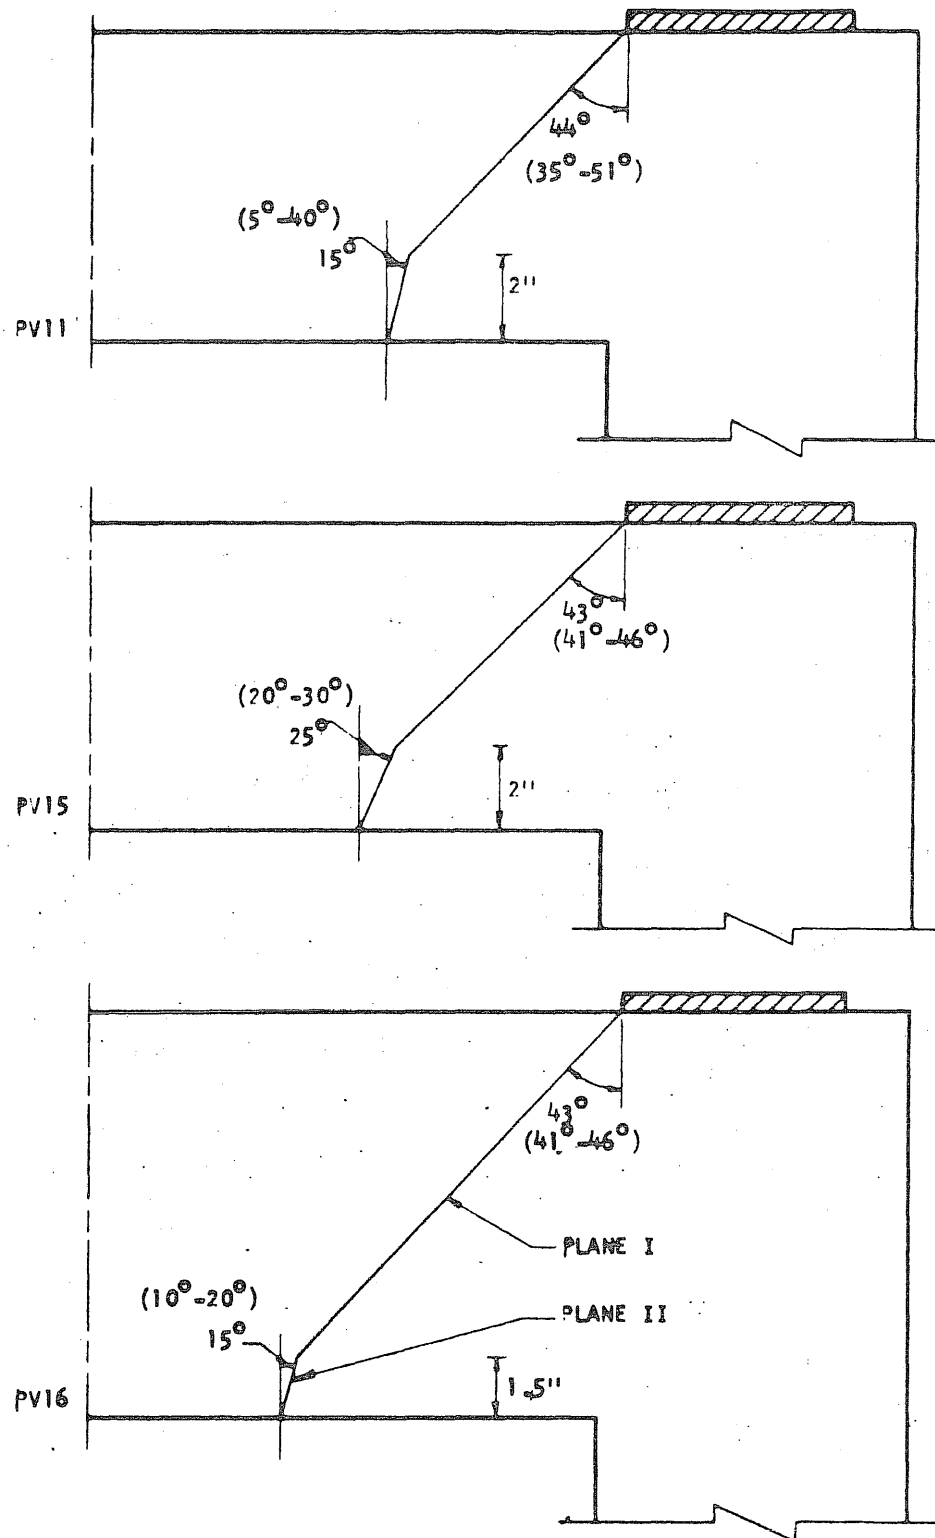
SECTIONS OF THE INCLINED CRACKS AND FAILURE SURFACES FOR VESSELS FAILING IN SHEAR
